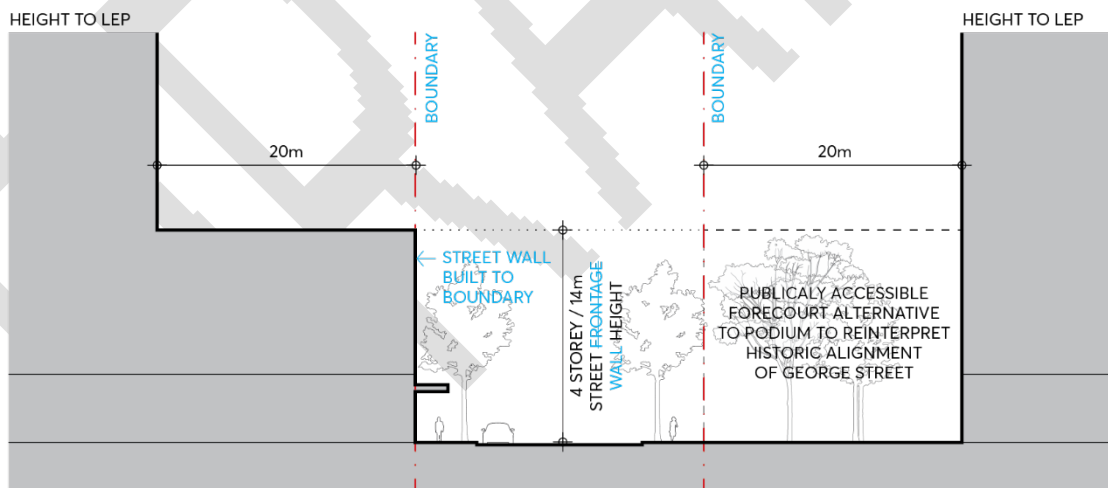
George Street west of Marsden Street – Street Wall Height and Building Setbacks
